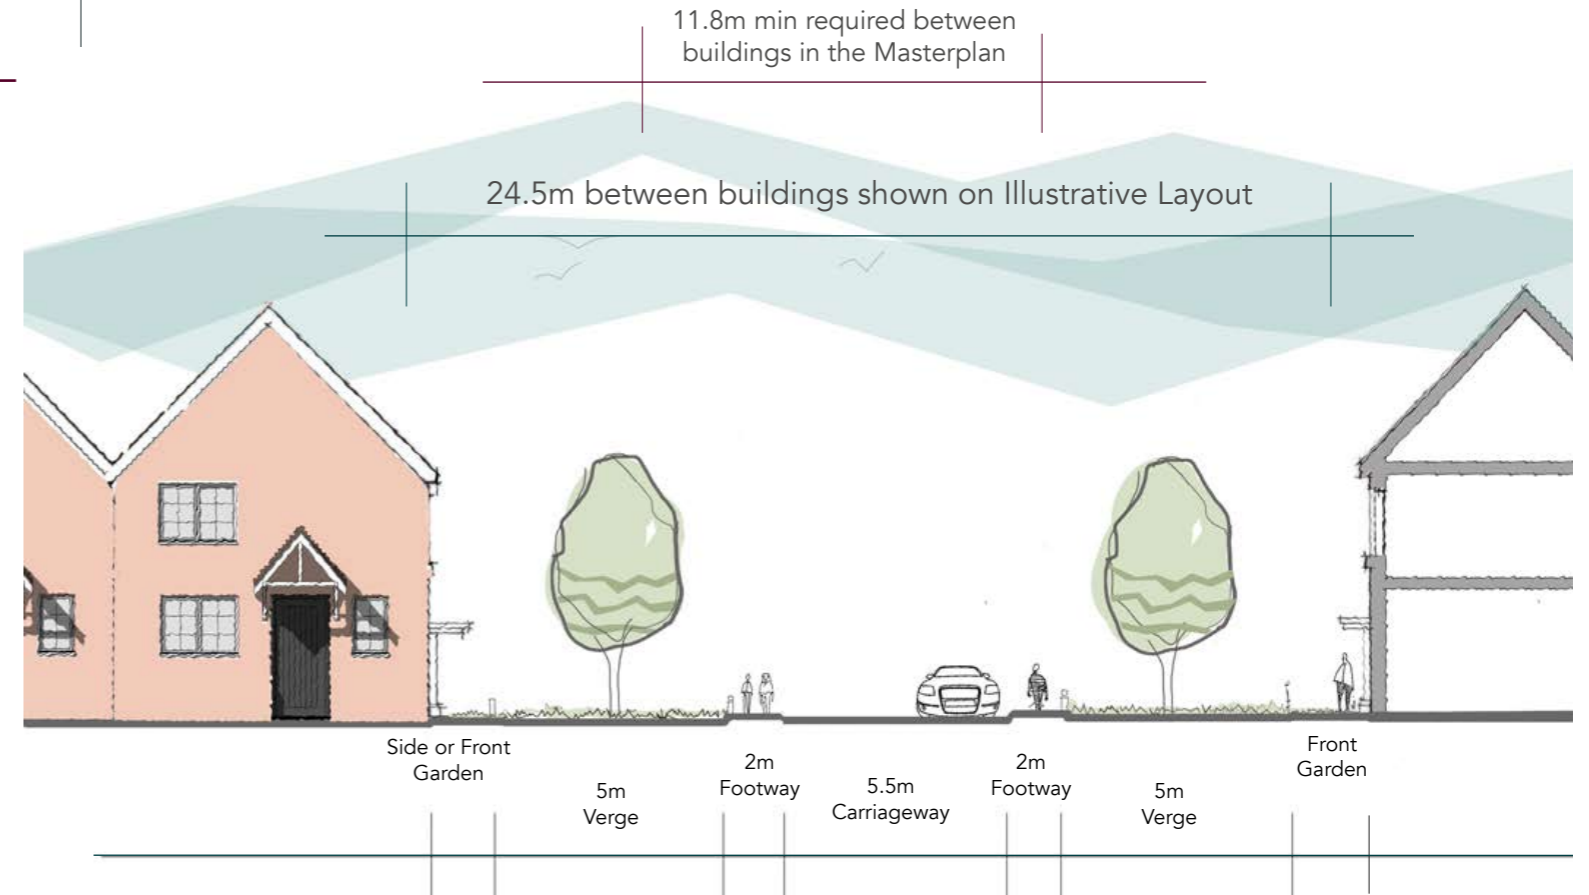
Illustrative section through a Tree-Lined Tertiary Street
